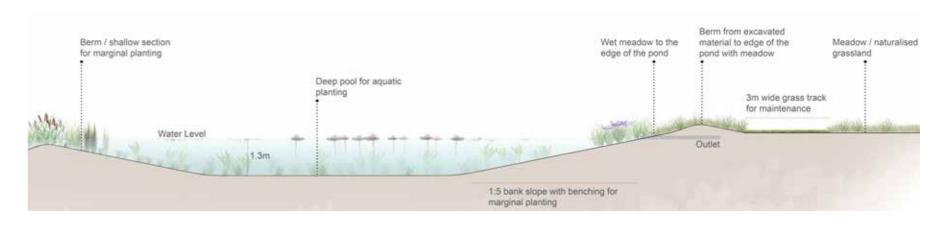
Typical cross section through attenuation pond, designed for wildlife #2
